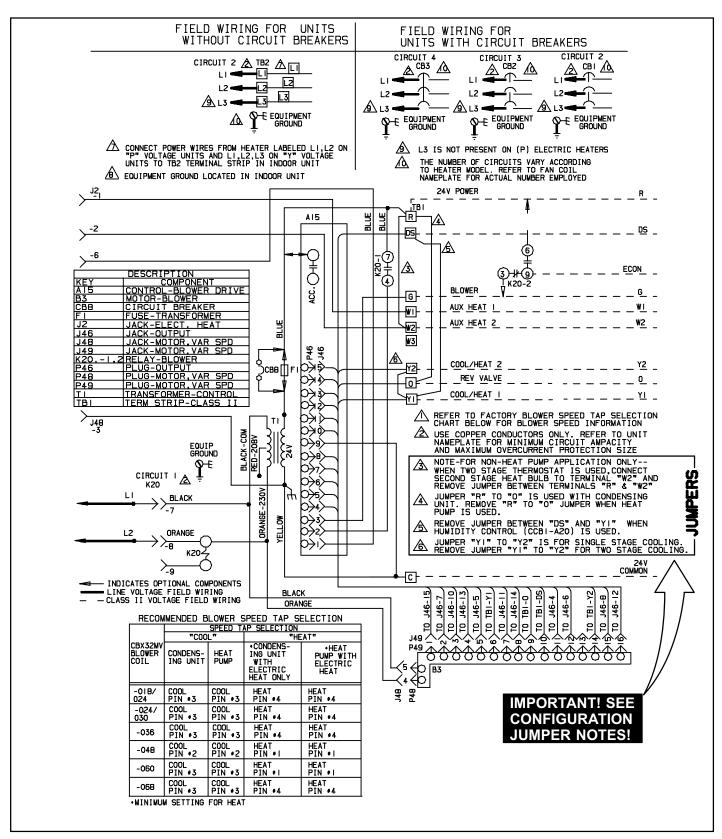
CBX32MV Air Handler Unit Typical Wiring Diagram
